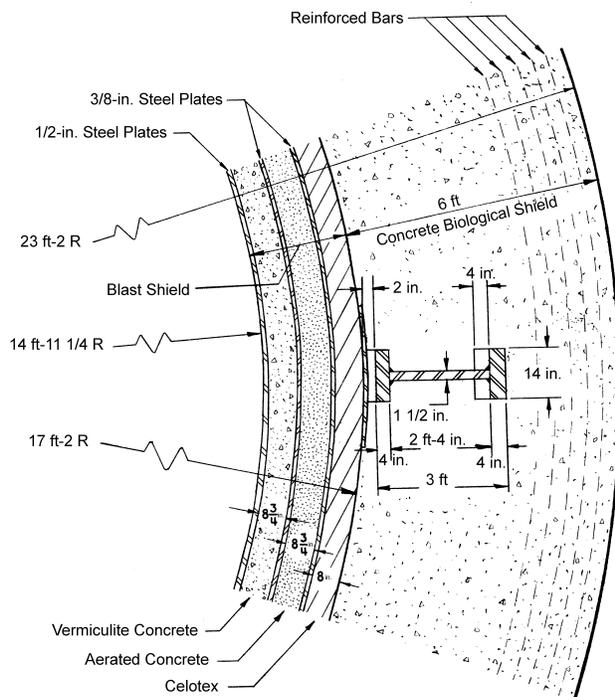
BLAST SHIELD AND TYPICAL COLUMN DETAIL FOR PRIMARY TANK SUPPORT STRUCTURE.
